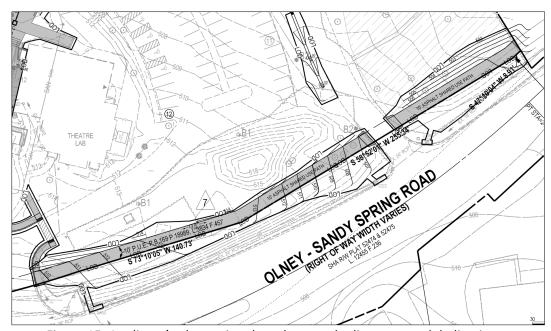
Applicant's alternative shared-use path alignment and dedication area
